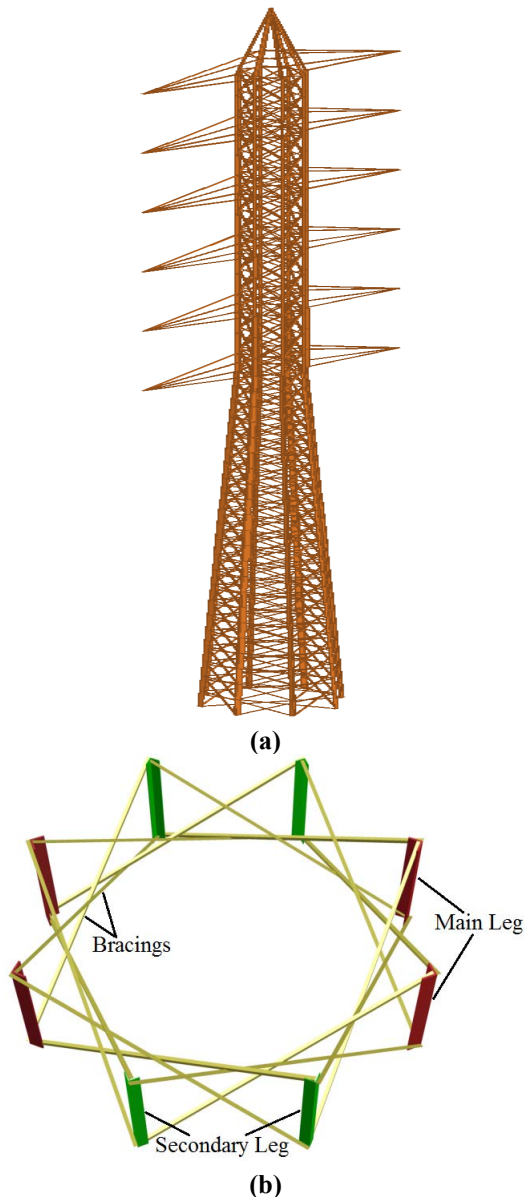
(a) 3d model of 8-legged tower. (b) Typical view of one panel.
